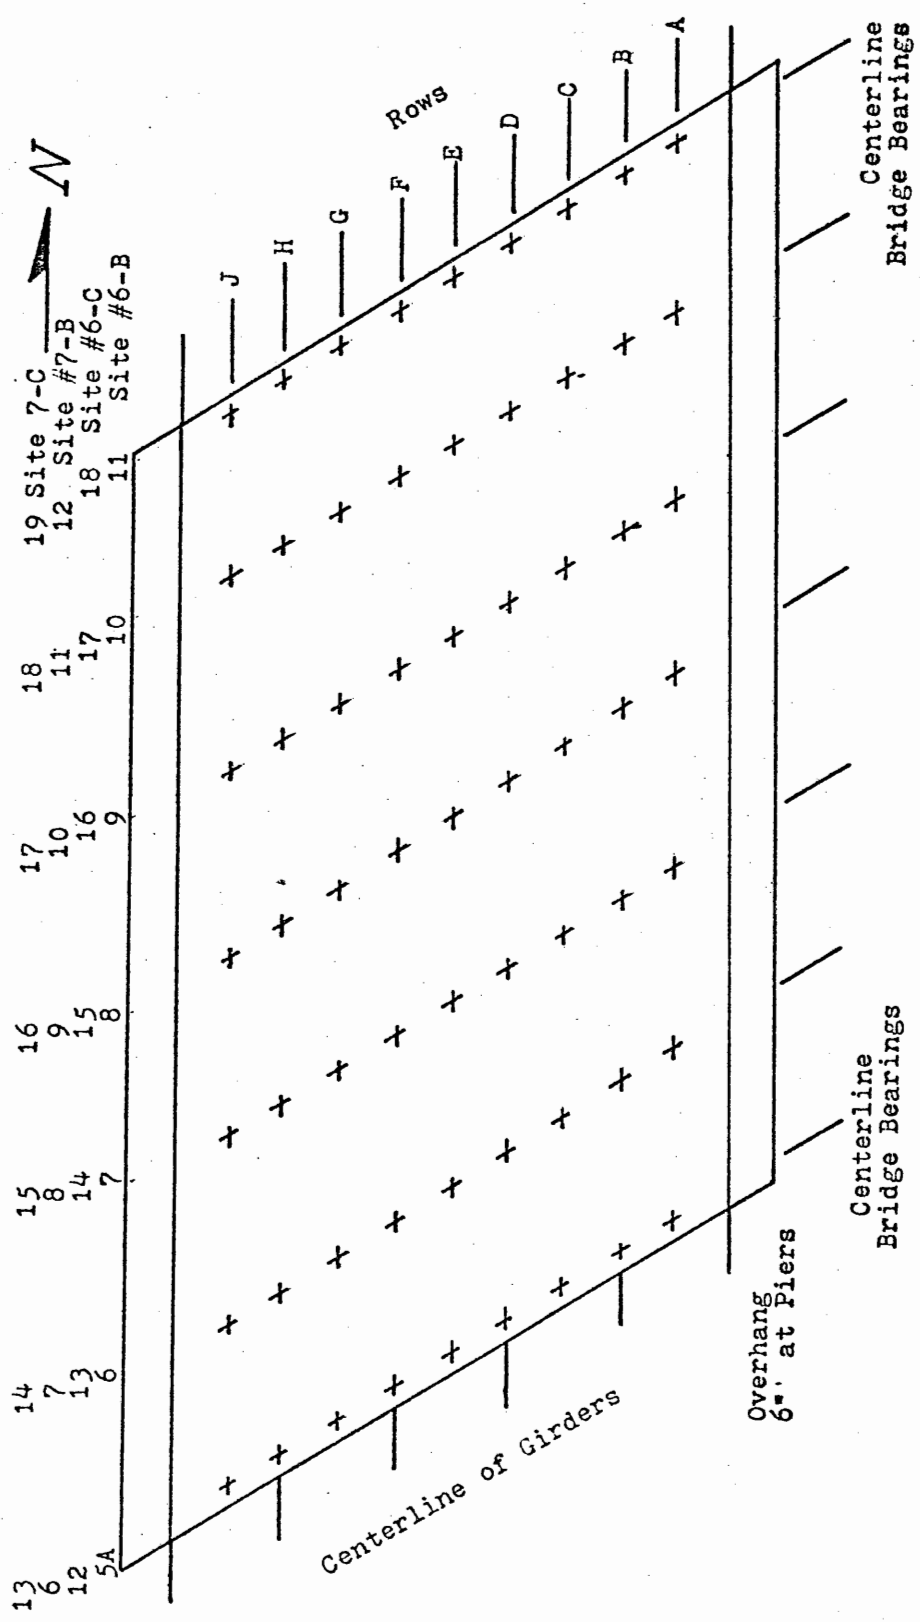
Test Pattern Layout, Interior Spans, Sites #6 and #7
